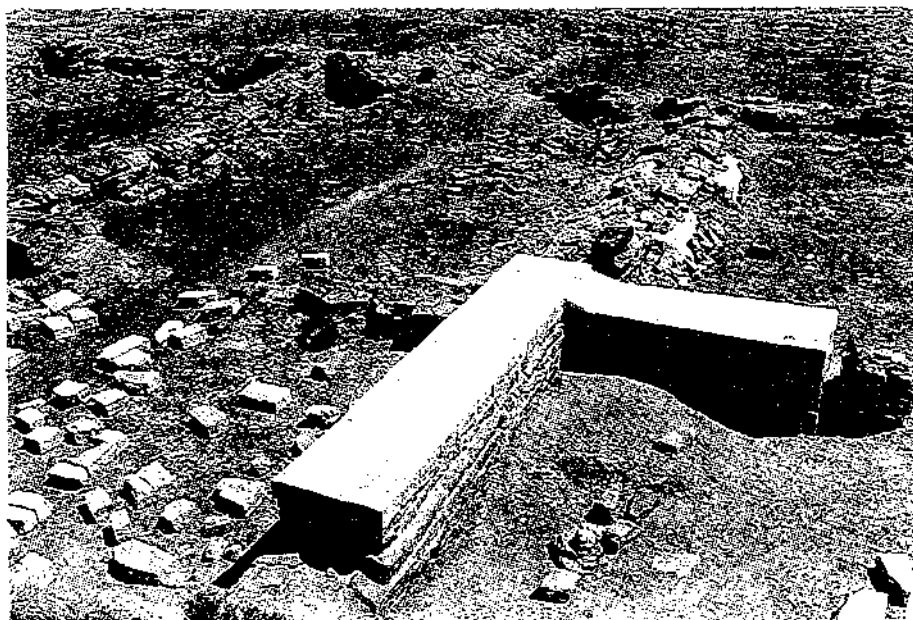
Terrace Building 4 after restoration and capping, from south-southwest.
